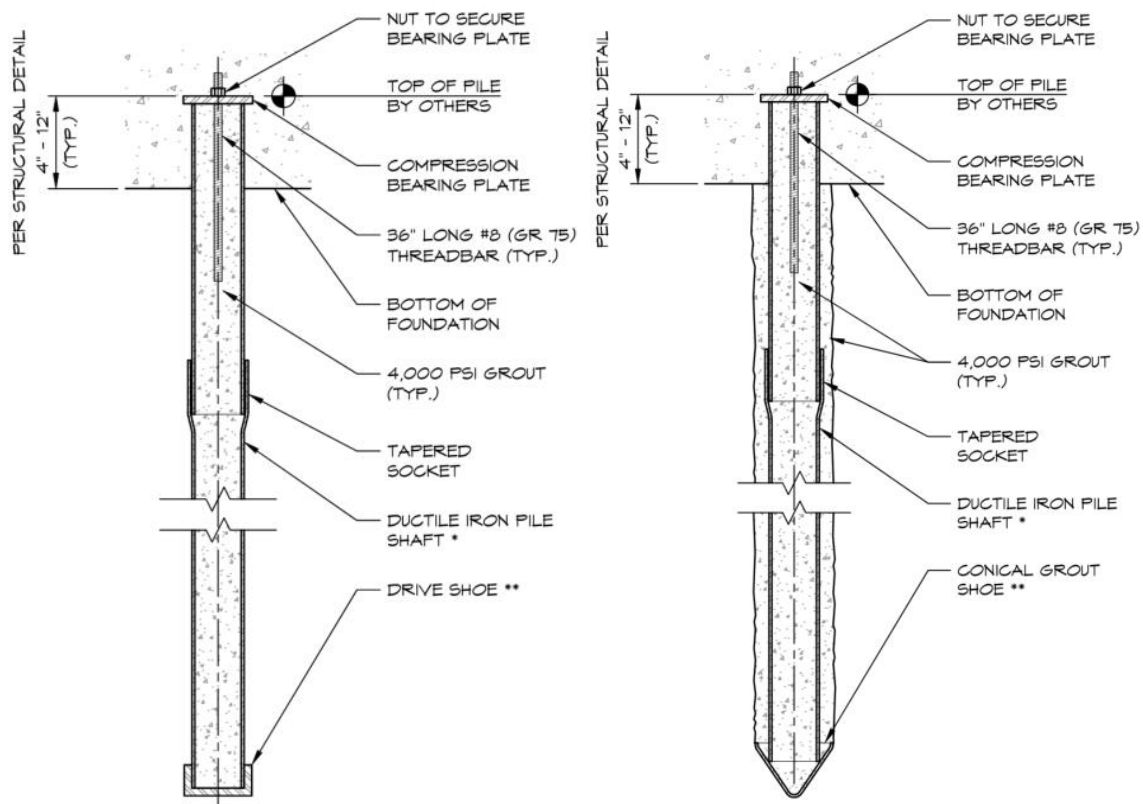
Example Details of Ductile Iron Piles in Compression – a) Non-grouted (Exterior) and b) Grouted (Exterior)
